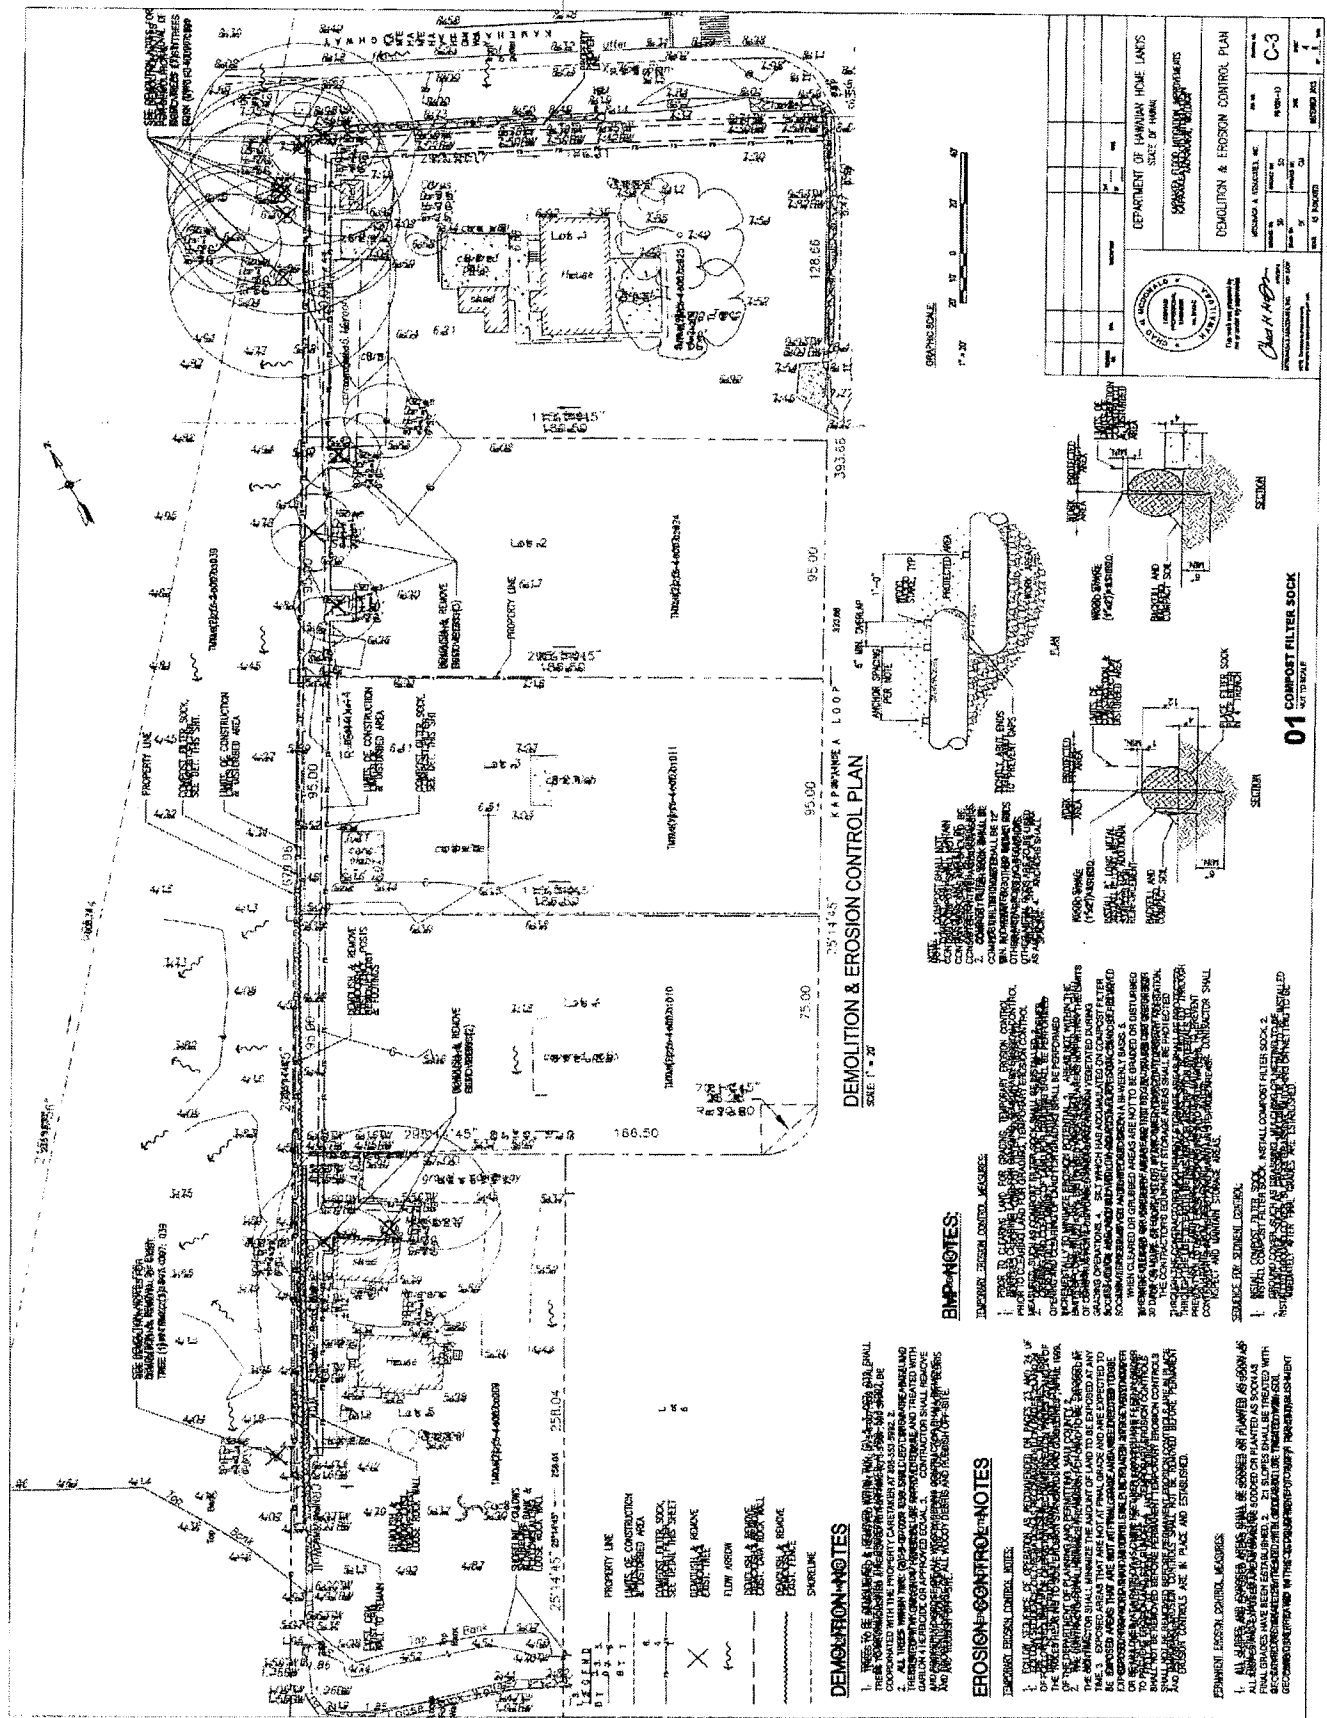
DHHL Kapa'akea Flood Mitigation Project site plan
